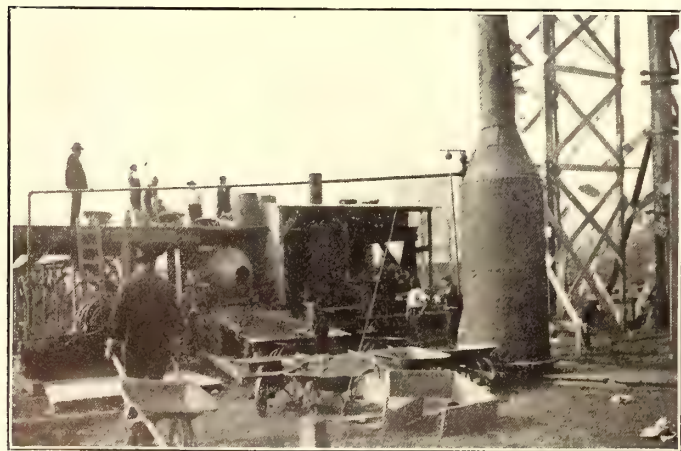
CONCRETE MIXING PLANT AND ELEVATOR
